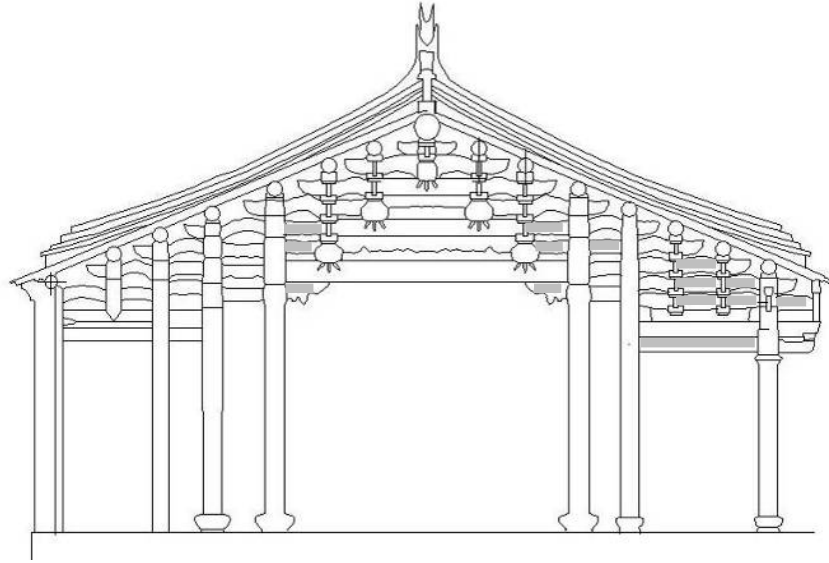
Damaged elements of Dou-Shan main hall right timber frame
